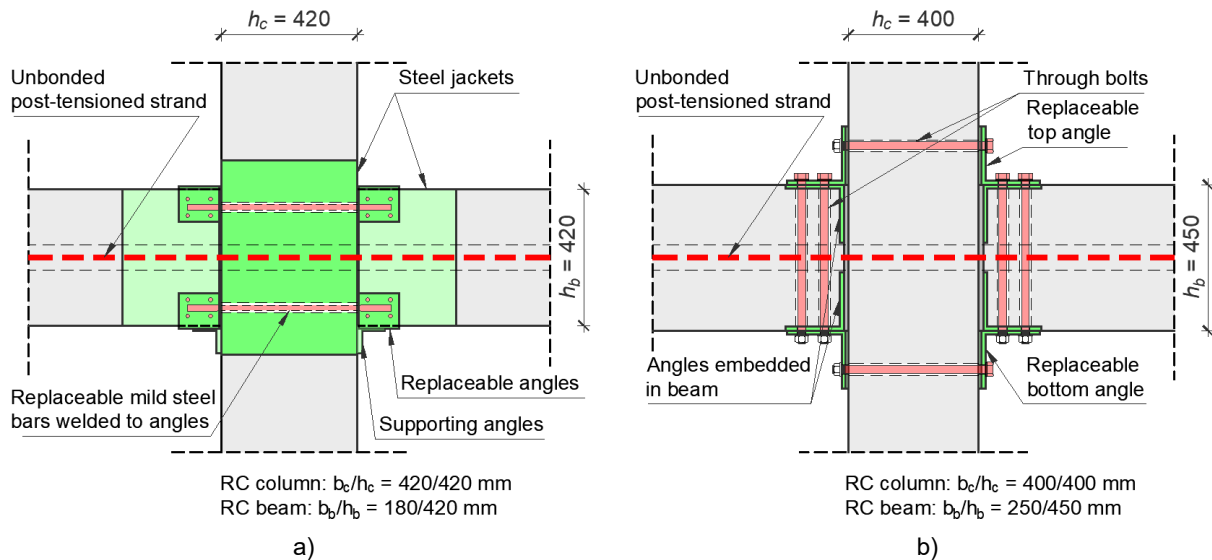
Beam-to-column joints with post-tensioned connections: (a) connections steel jackets and replaceable bar and angles (adapted from Wang et al. [49]), (b) connections with replaceable steel angles and through bolts (adapted from Cai et al. [50])
